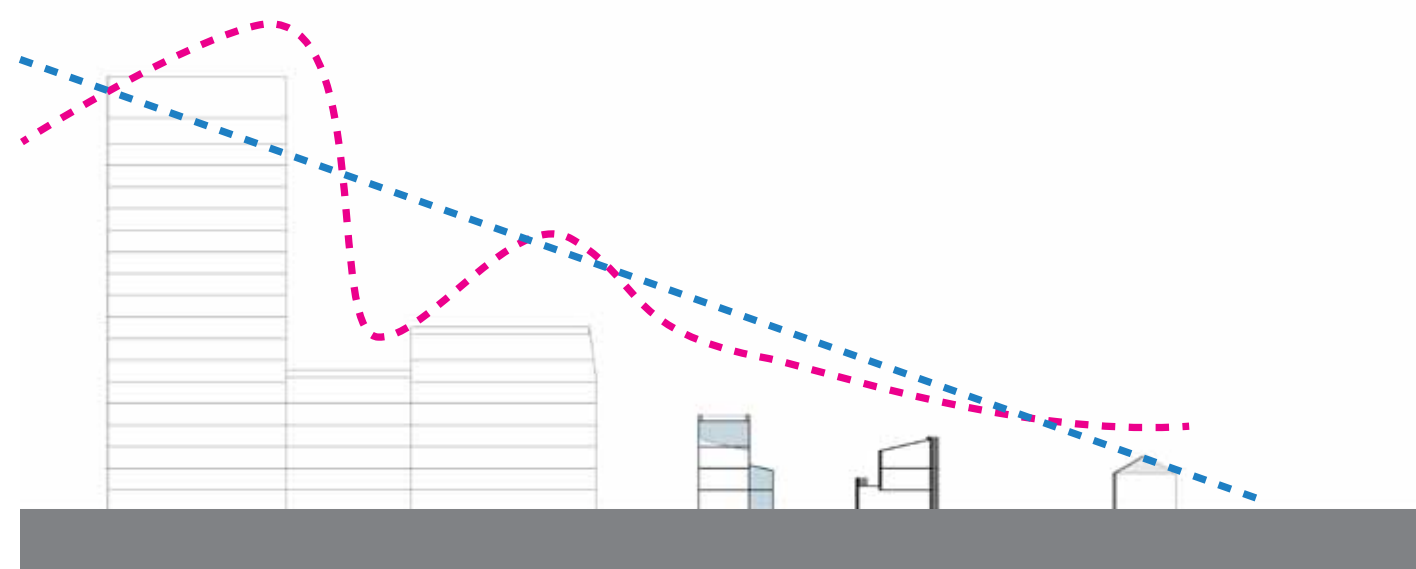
Phelp Gardens Elevation - Proposed Massing
